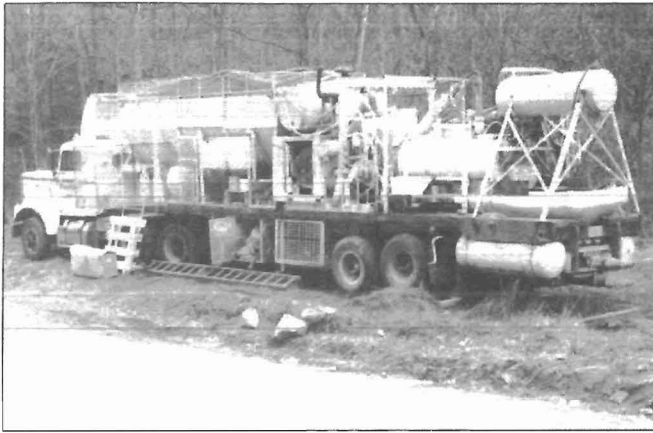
Truck-mounted equipment for mixing and placing lightweight concrete.
